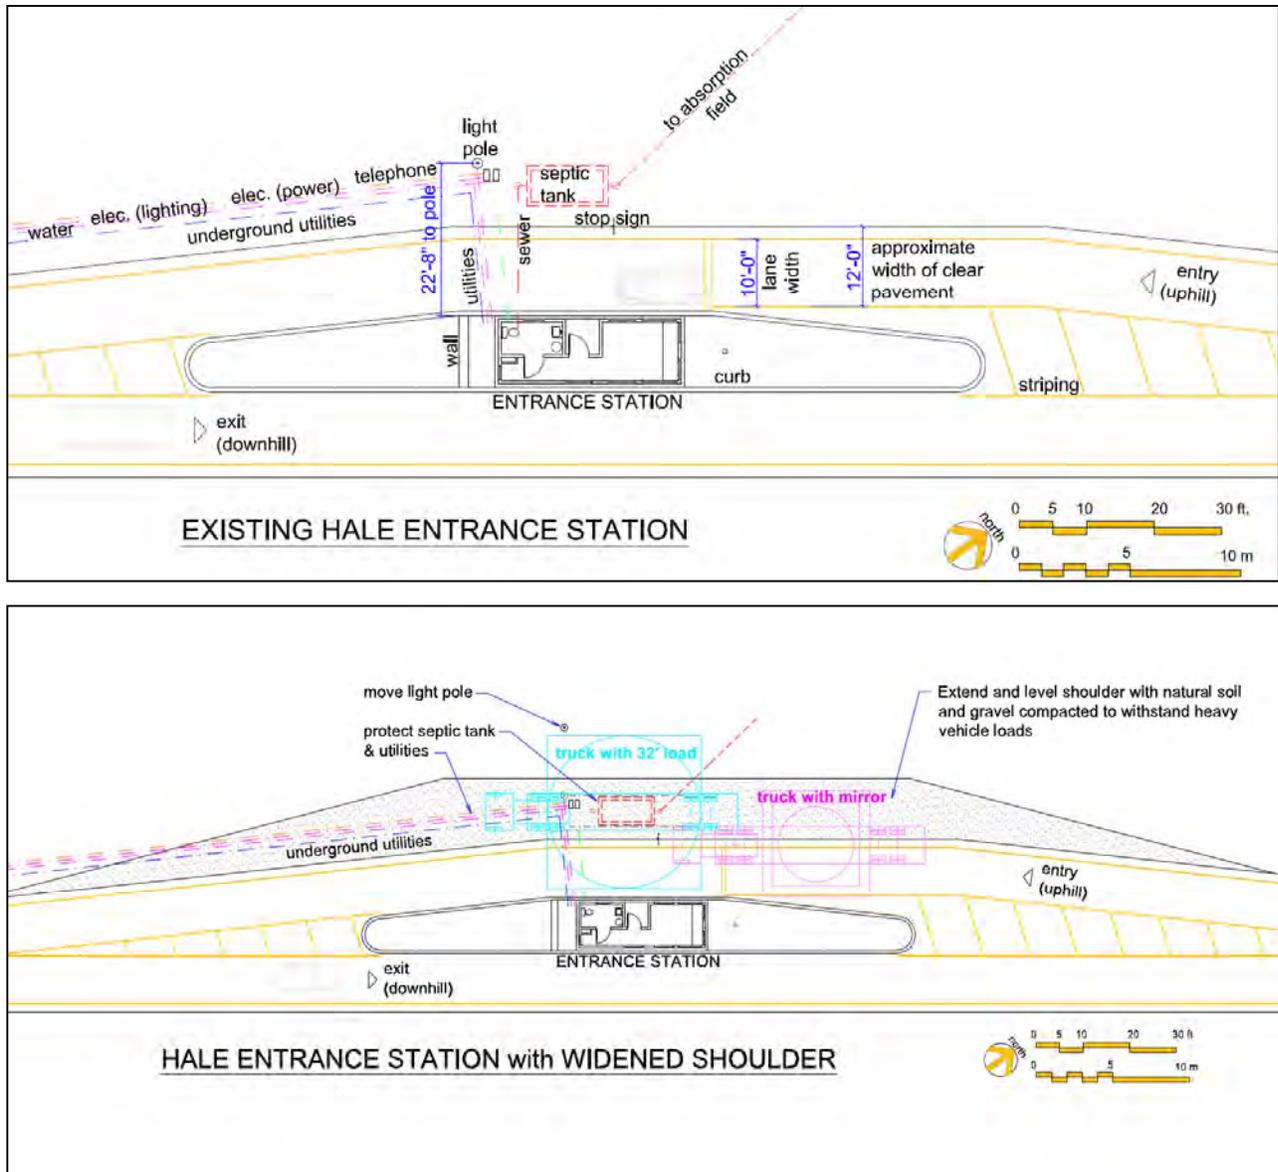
Existing HALE Entrance Station and Proposed Widened Shoulder.
